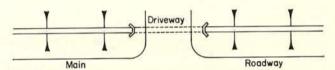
Typical culvert layout with unsafe headwalls that often has been used at driveways and intersections.
